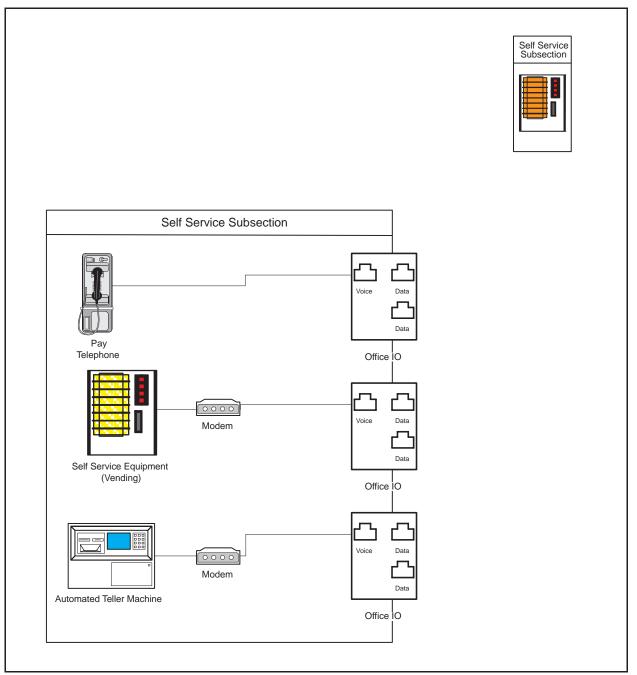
Large AO Building Self Service Subsection Layout
